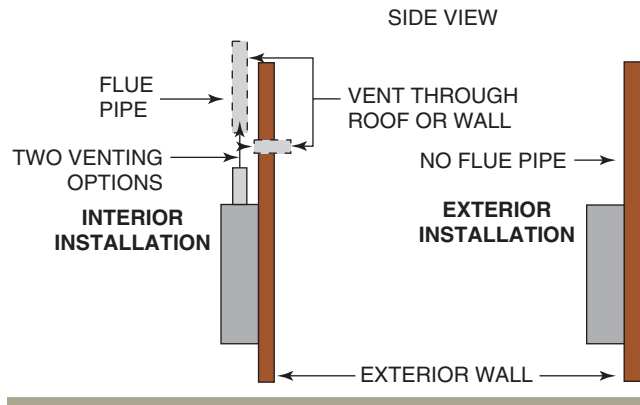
Tankless gas water can be installed inside or outside a home. Interior flue pipes vent to outside either through wall or through roof.
